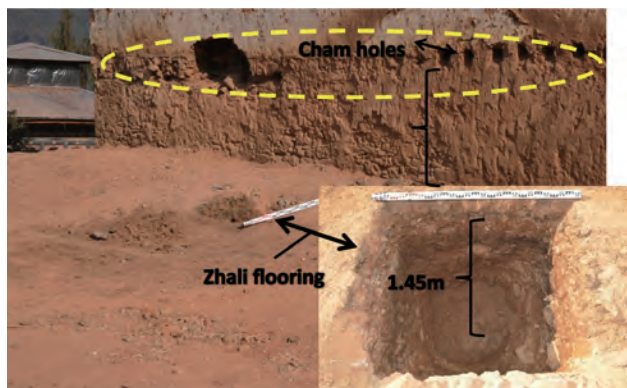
Shows the remains of Cham holes on the outer facing of northern wall and the Zhali flooring at 1.45m below the present ground level (sector E)
